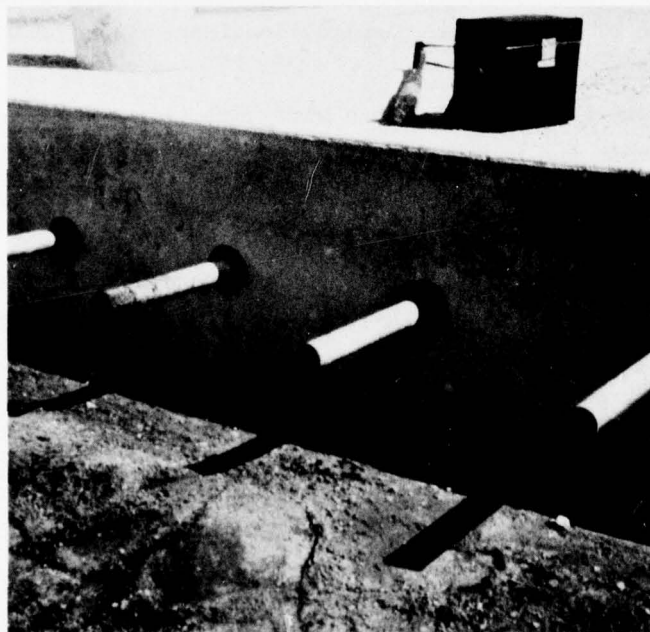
Completed longitudinal construction joint (rubber grommets still in place)
